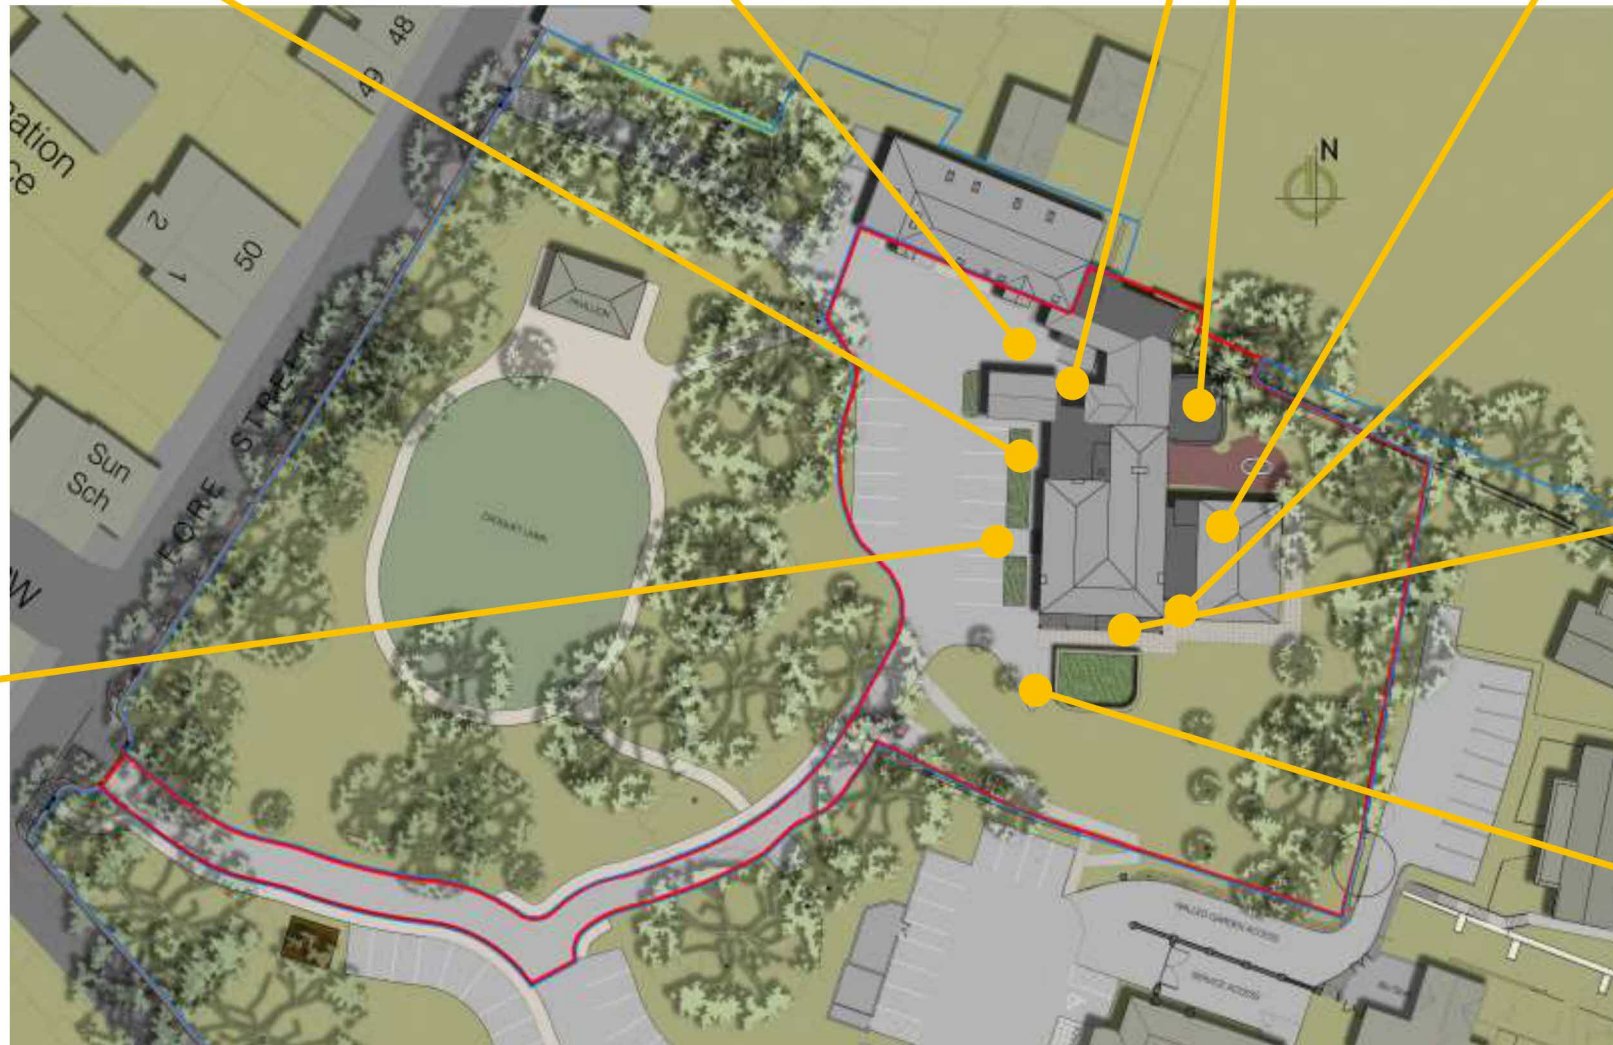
Penlee House – Existing Site Plan – Highlighting the Photographs of Built Environment
